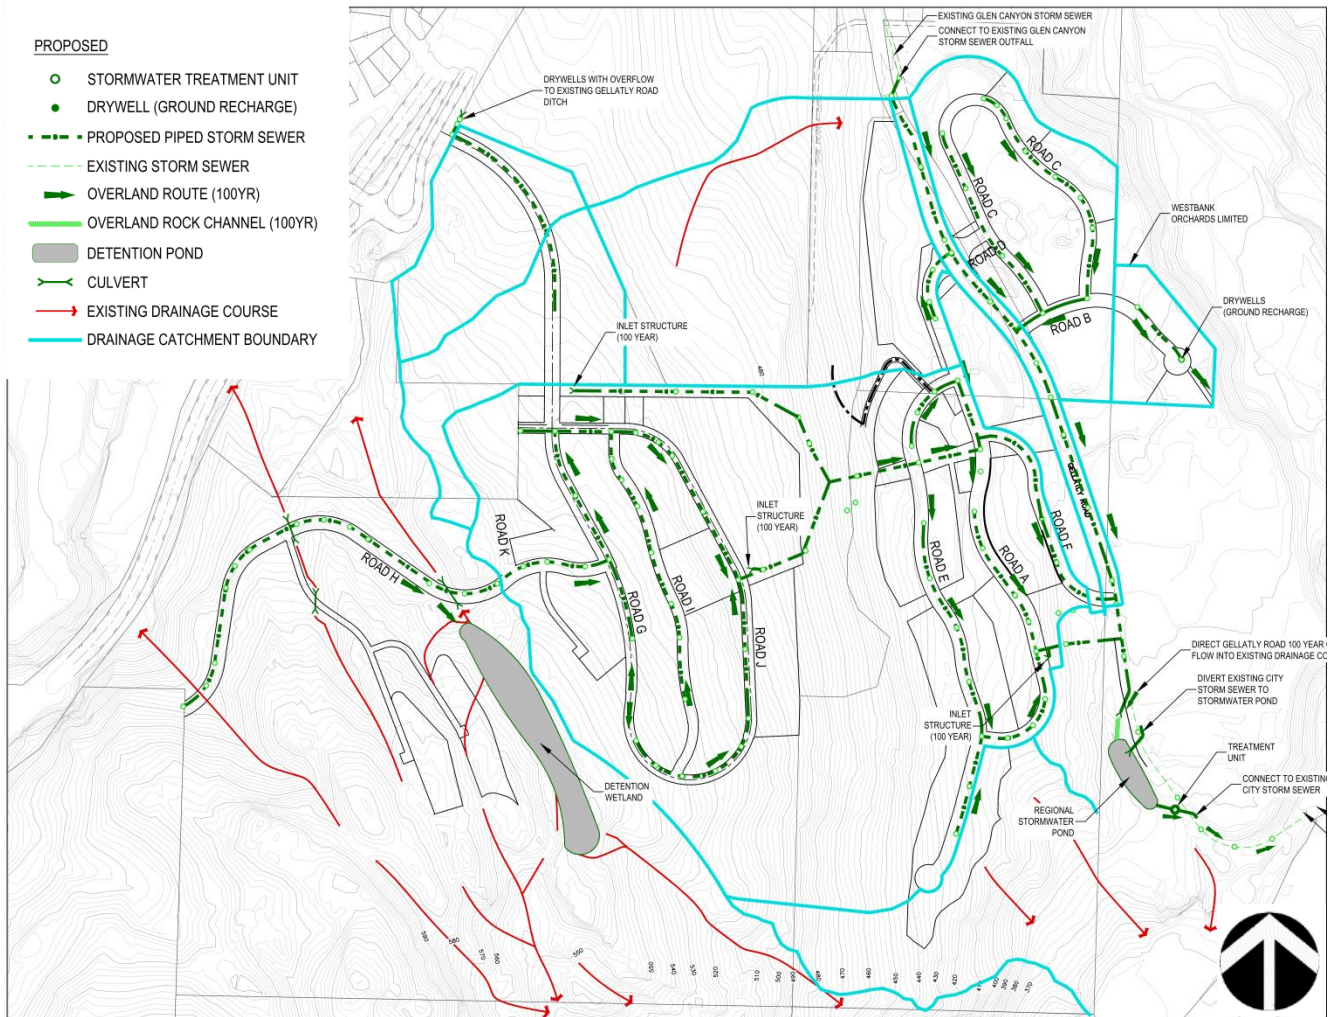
Master Drainage Plan – Alternative Regional Facility
